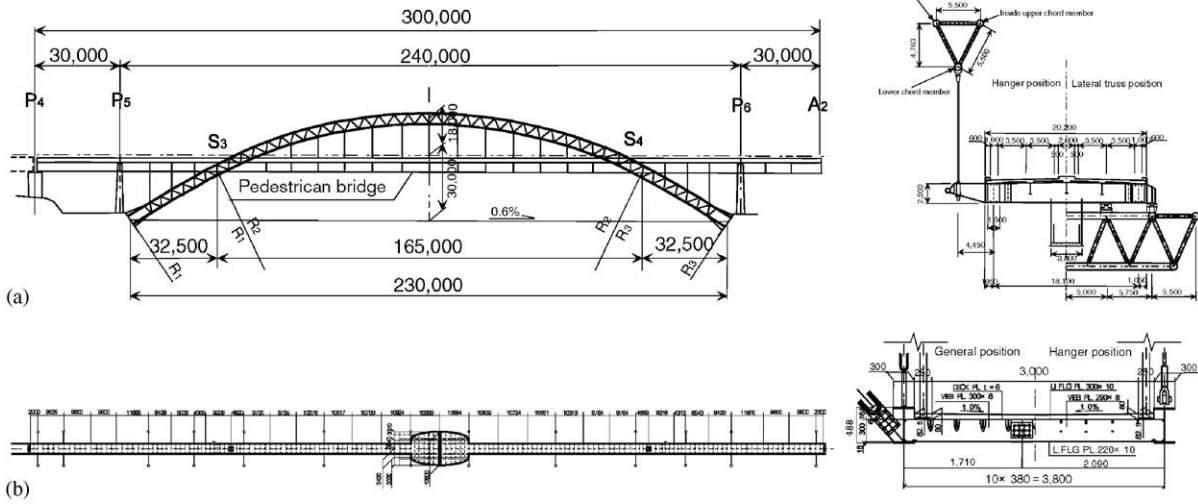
General view of the Second Saikai Bridge (unit: mm). (a) Main bridge; (b) Pedestrian bridge.
